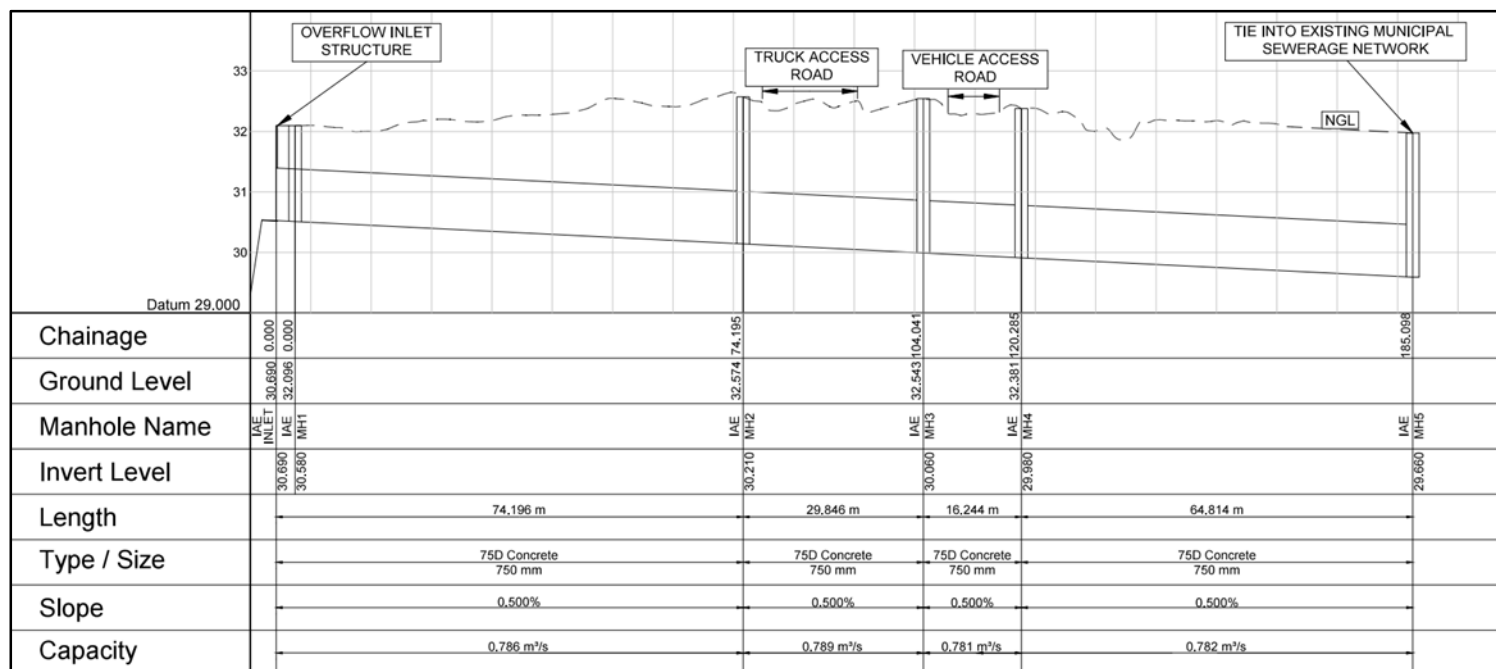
Long section of proposed new stormwater infrastructure between the attenuation pond overflow and IAE MH5.
